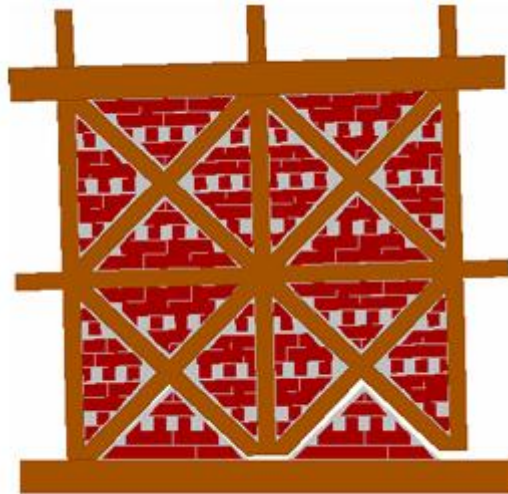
Overturning of Dhaj-i-Dewari wall [9]
